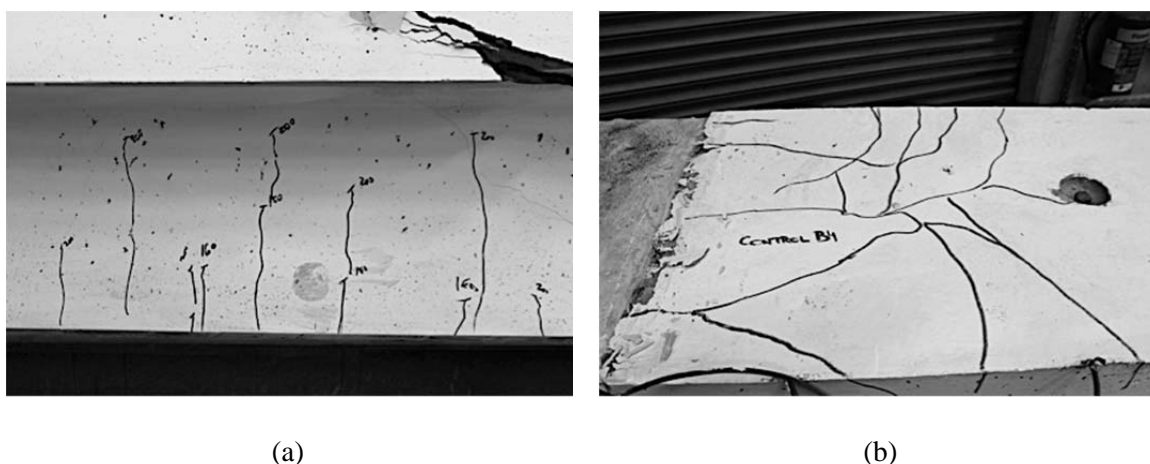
Specimen MBC examination after testing: (a) flexural cracking at midspan, (b) slab failure mode.
